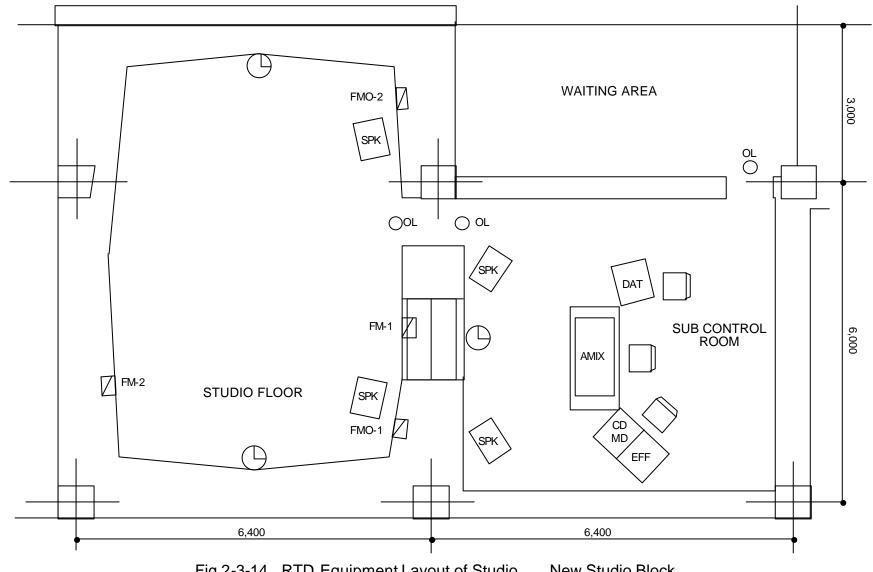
RTD Equipment Layout of Studio , New Studio Block
